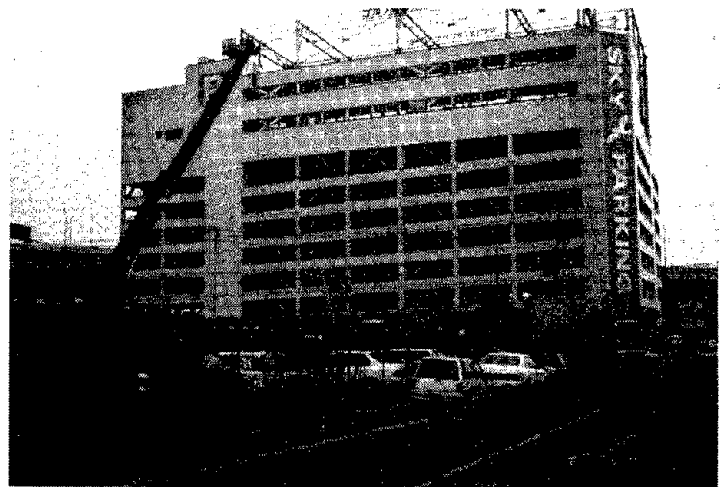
Elevation of a six-story, steel-braced parking structure
